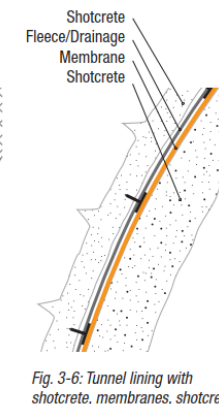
Tunnel lining with shotcrete, membranes, shotcrete
